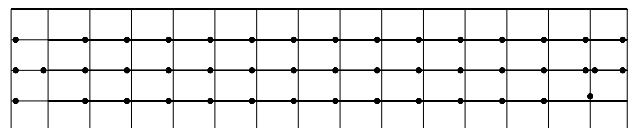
Plastic Hinges - 1st floor seismic retrofit
